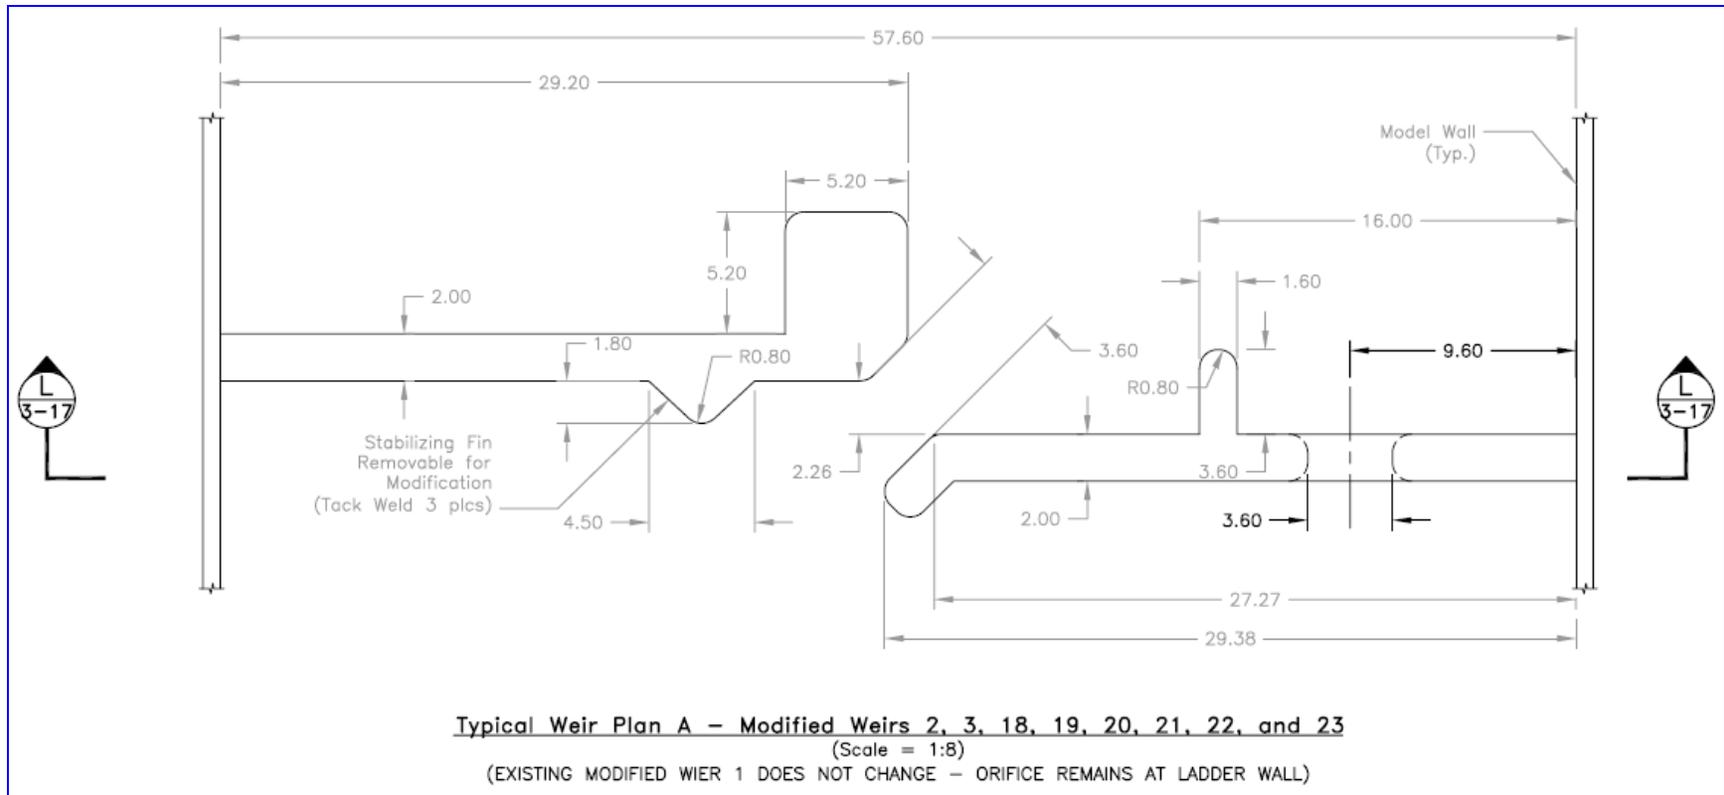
18-inch Weir Configuration, Plan View (Weirs 2, 3, 18 -23) —Excerpt from Model Drawing 3-16 provided by ENSR (Inches Model Scale: 1:5),
